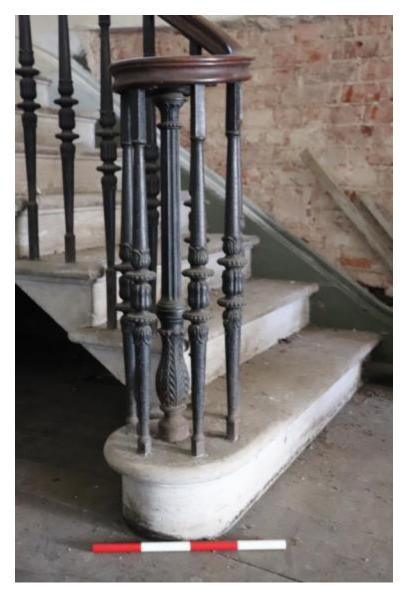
Phase 3 staircase balustrade detail, ground floor, looking east, scale 0.4m
